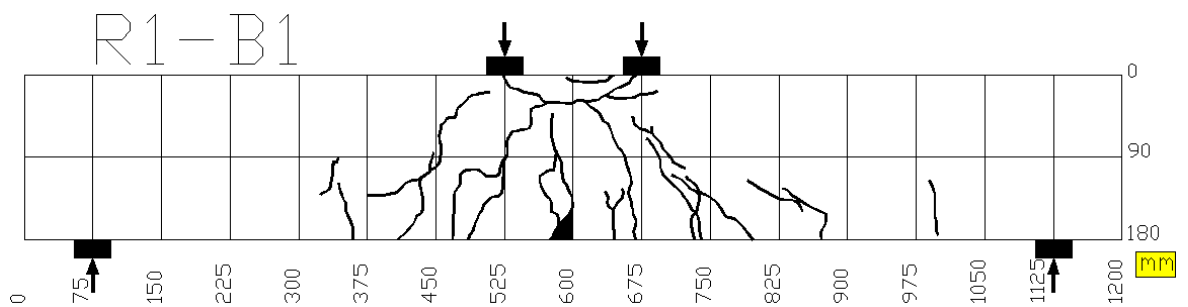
Crack Pattern for Beam (R1-B1) At Failure
